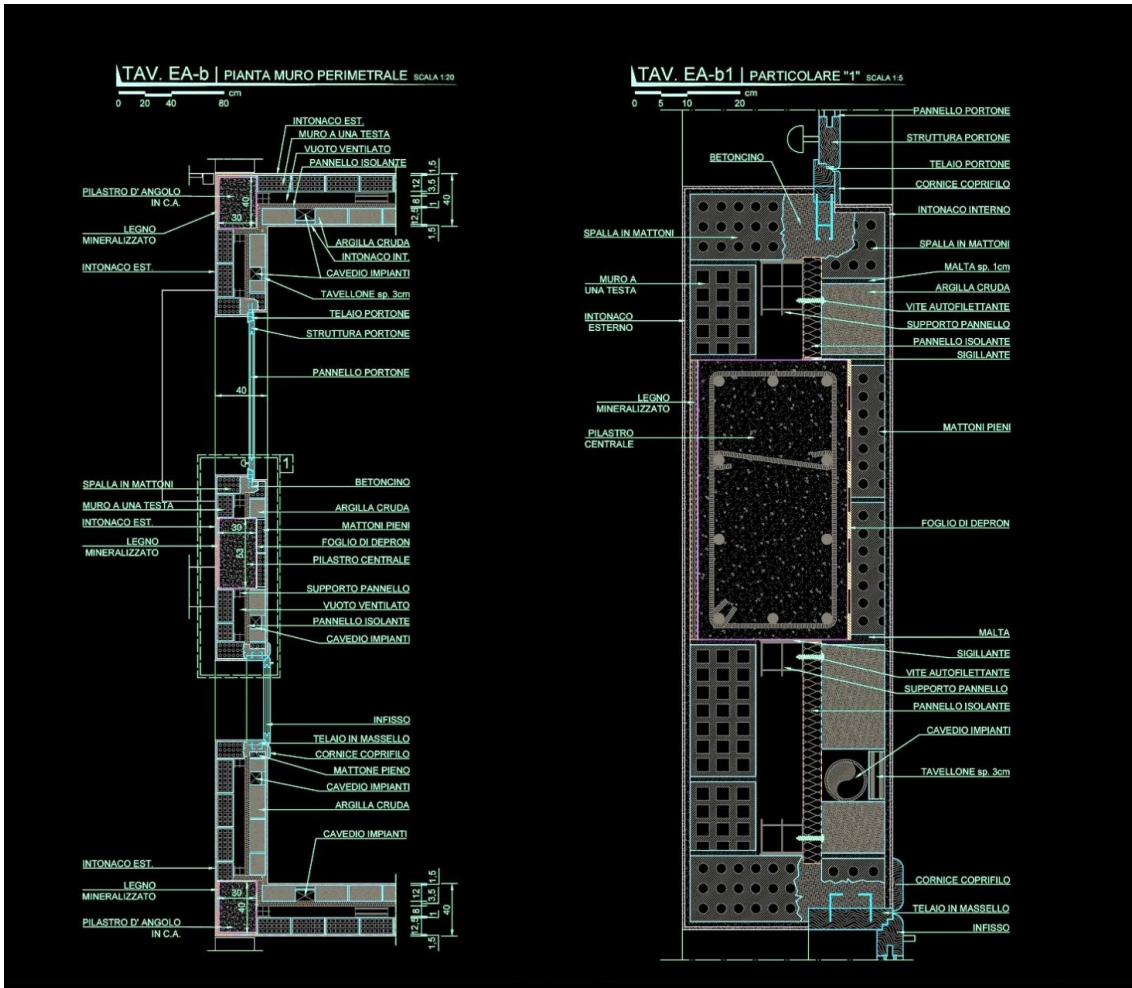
Graphic - geometric work relating to the modeling of the construction elements of details at the 1/20 ratio scale and building details at the 1/5 ratio scale of the 530x300 mm pillar. Drawing and CAD laboratory (X). Operator: (Y) – Lecturer: (Z).
